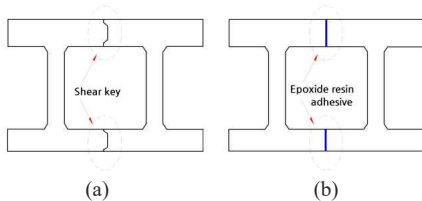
Lateral girder connection with PS tendon (a) Shear-key (b) Epoxide resin adhesive
